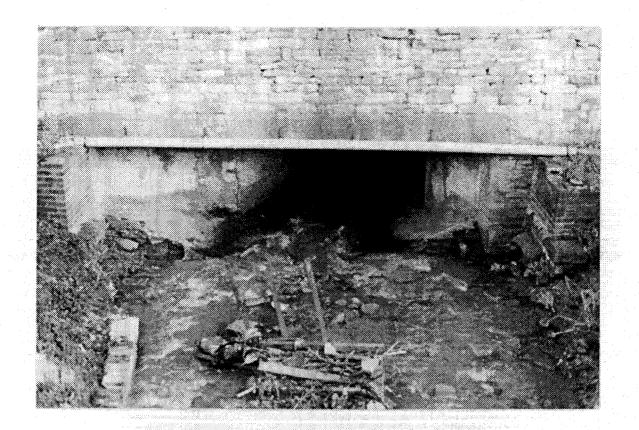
CULVERT No.7 (Inlet above - Outlet below)
